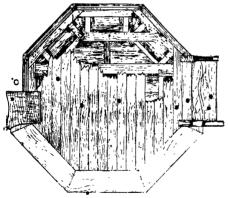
Part Plan and Horizontal Section • of Pulpit at A (Fig. 1850).
